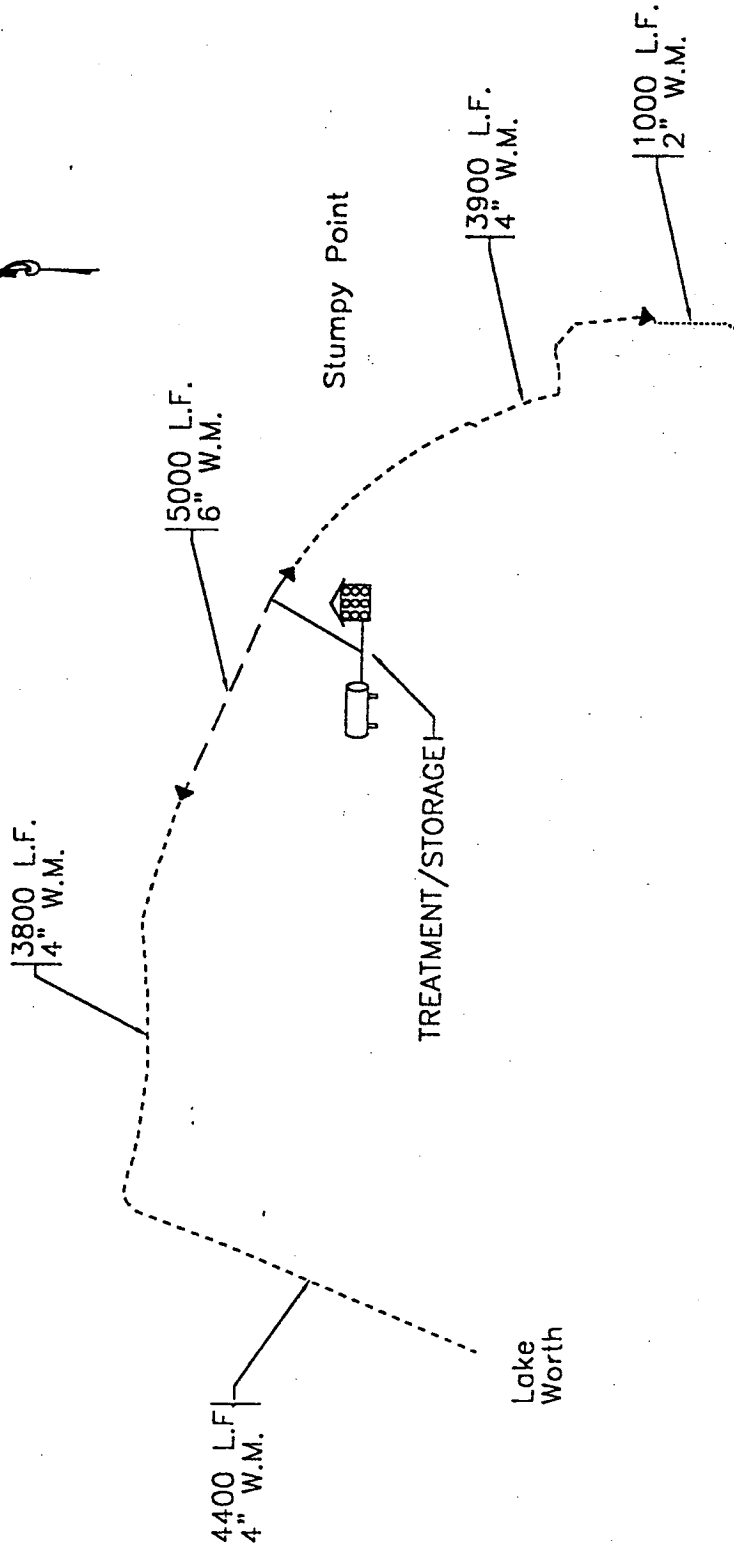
SYSTEM LAYOUT WITHOUT FIRE PROTECTION AND UTILIZATION OF THE SITE NEAR THE COMMUNITY BUILDING.
